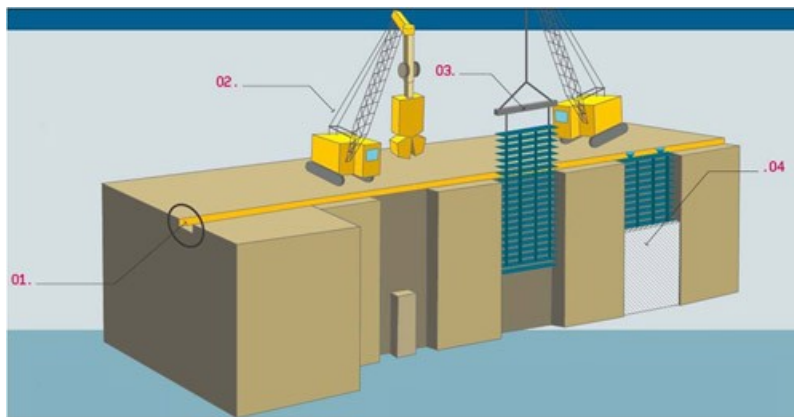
Construction phases of a diaphragm wall in reinforced concrete (www.omranista.com)
